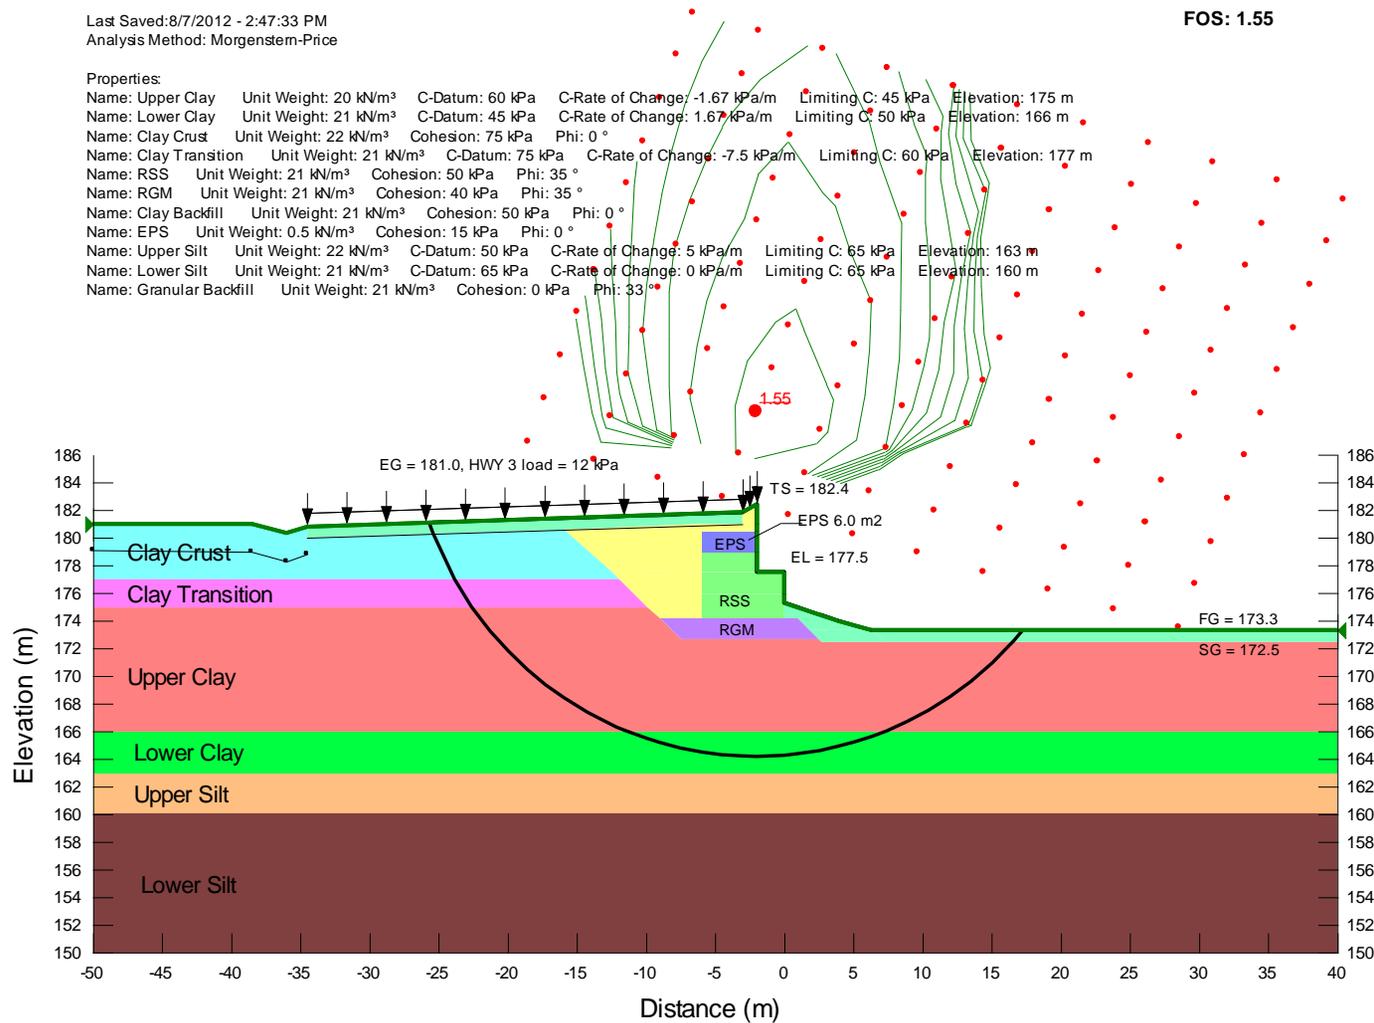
Global Stability Result – North Abutment (10+170) – Long Term (Drained) Loading
